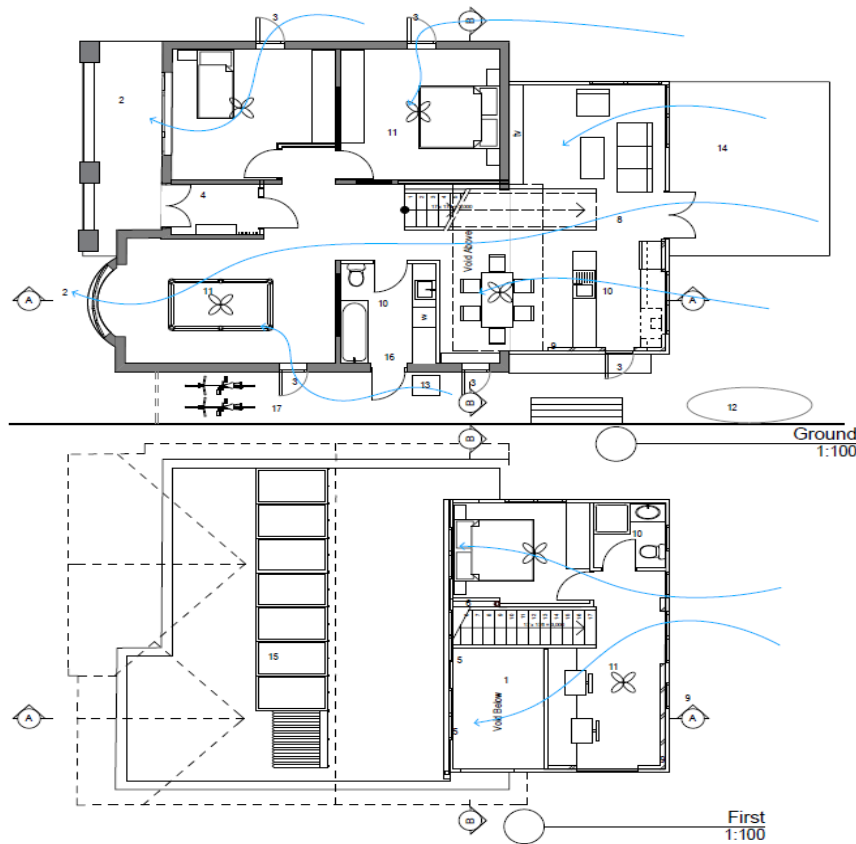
Proposed floor plans (top - ground floor, bottom - first floor)
